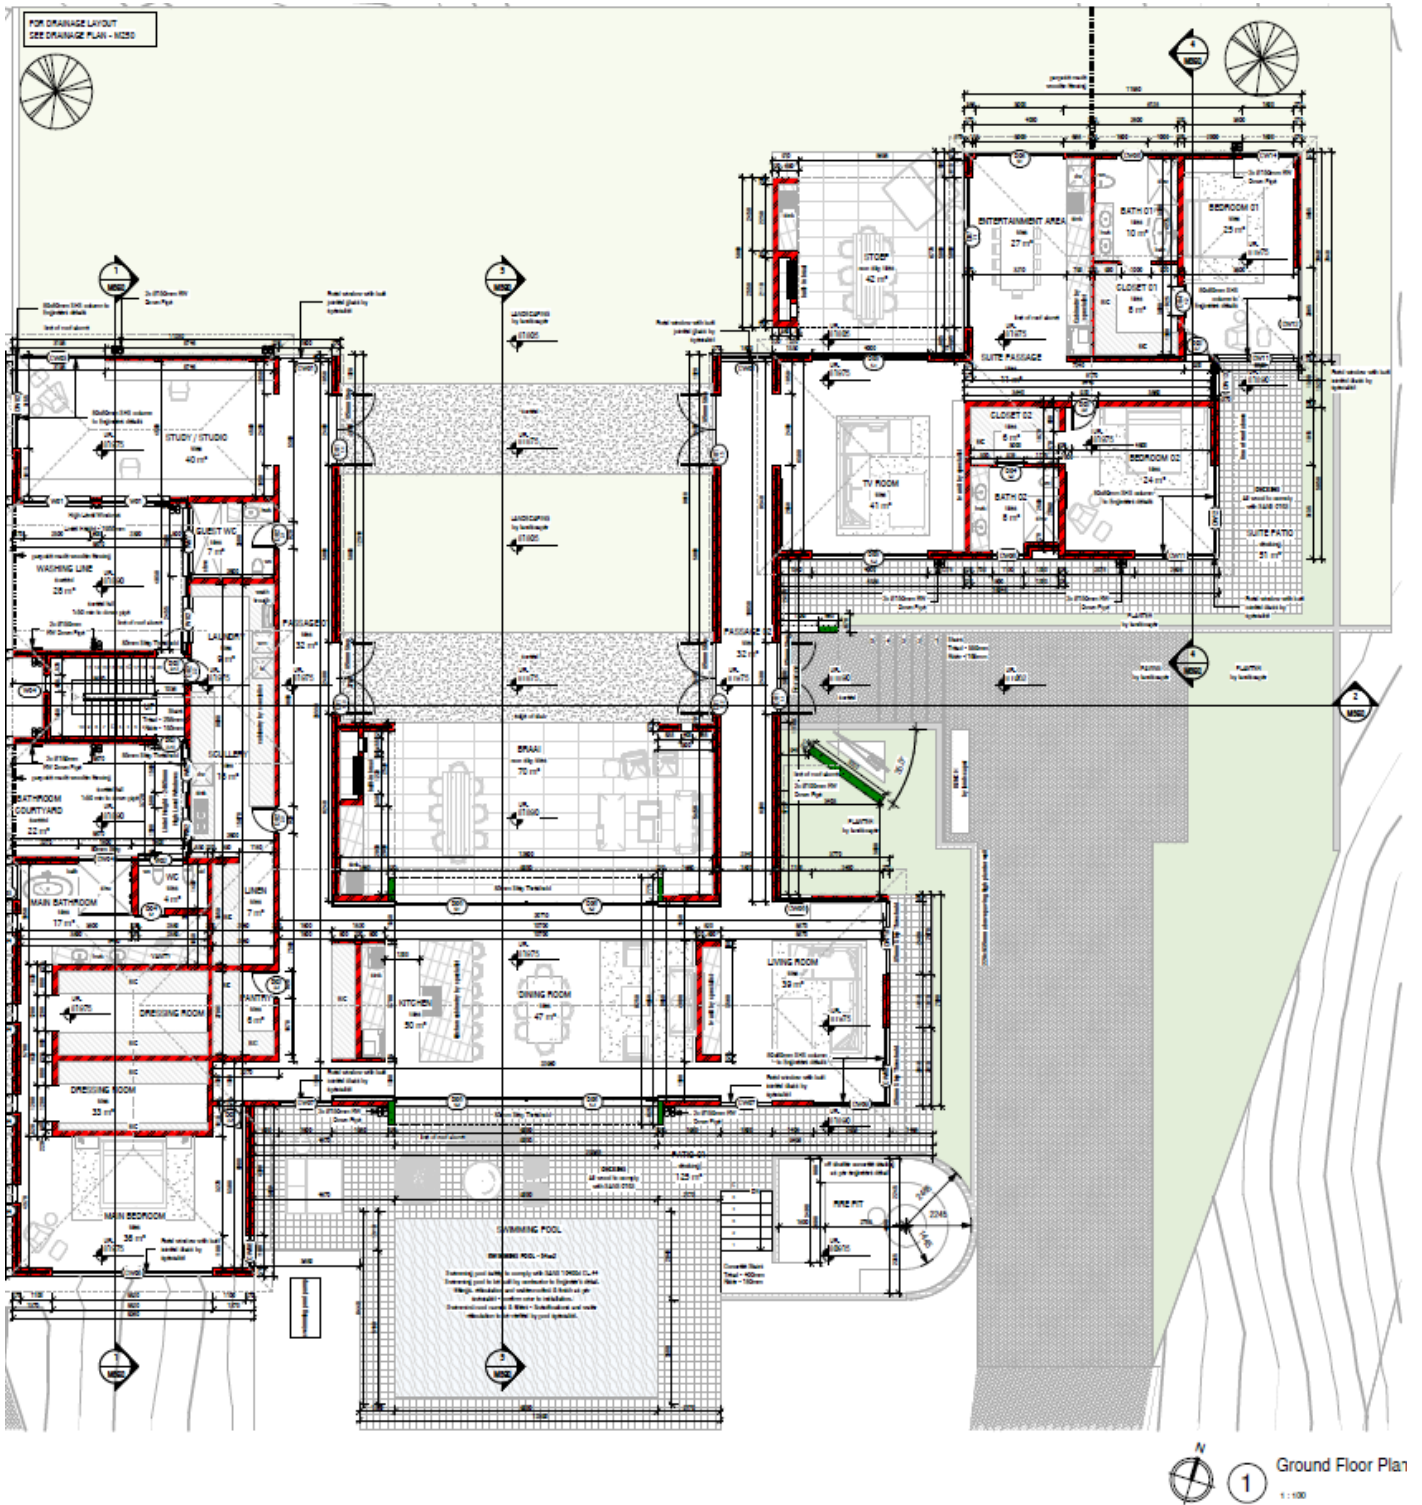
Ground Floor Plan (Mathews + associate architects, 2024)
